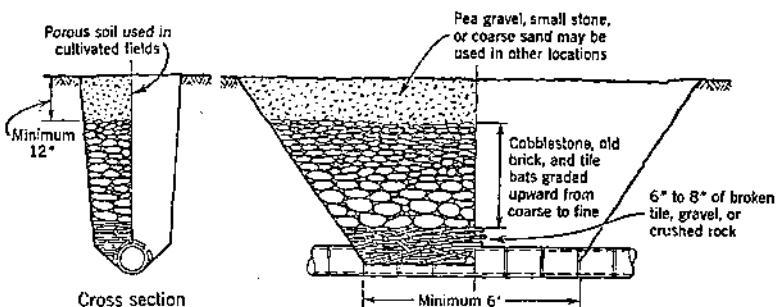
Blind inlet or French drain. (Redrawn from reference 20.)
